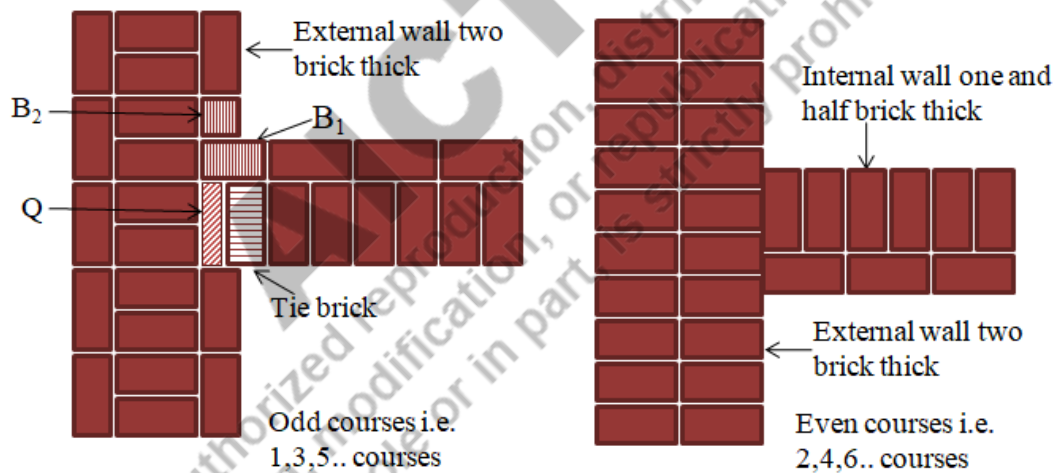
(d) Tee-junction between one and a half brick thick wall and two brick thick wall
